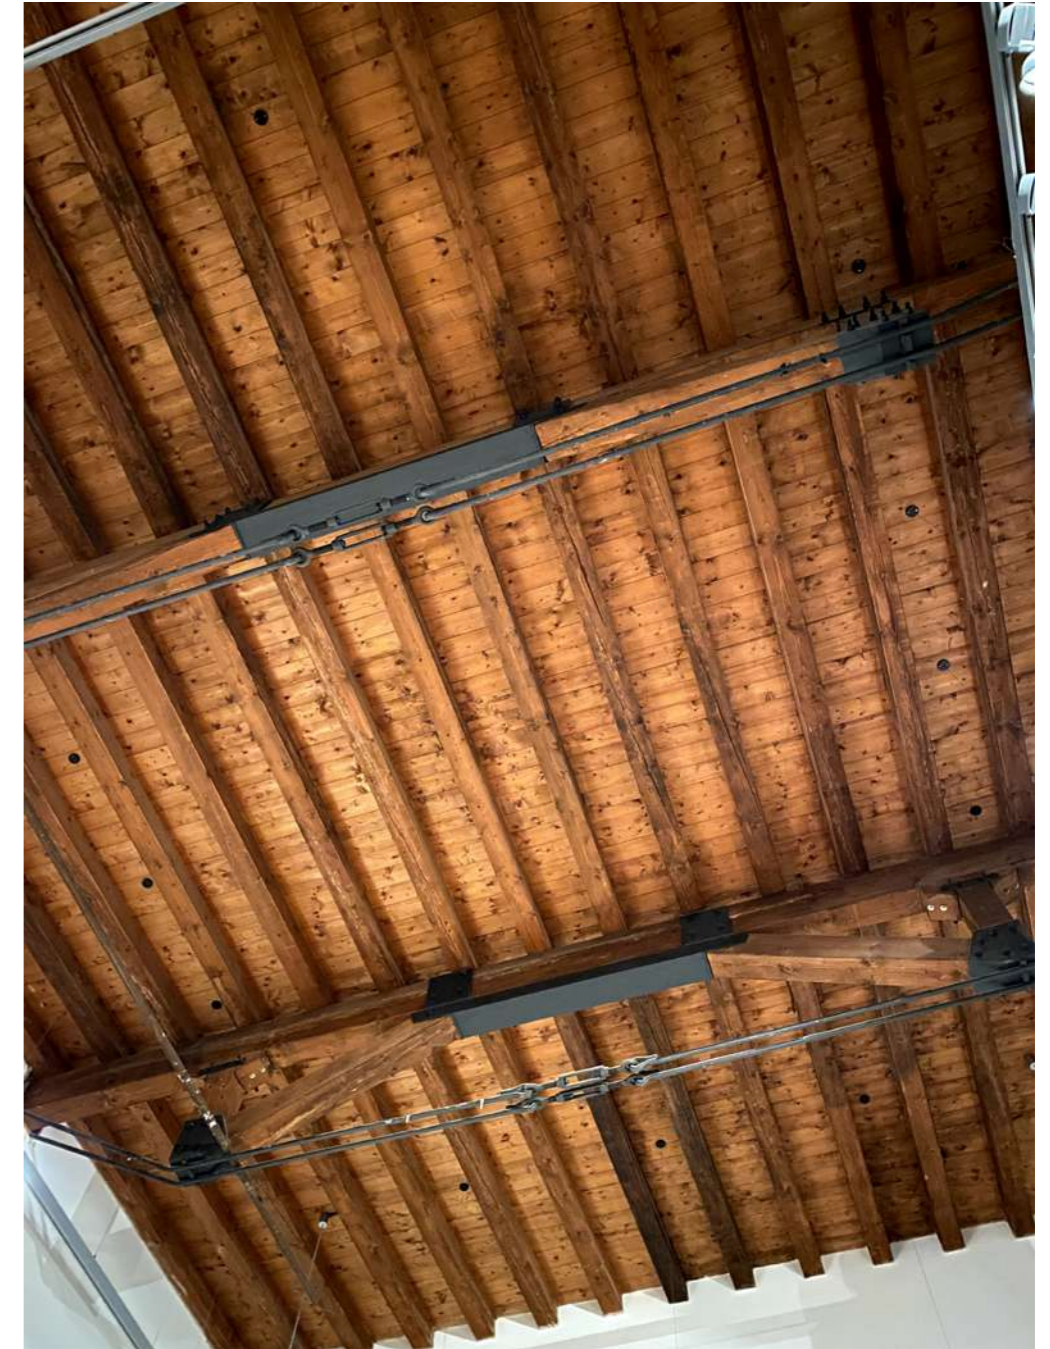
Consolidation works and creation of wooden beams with steel reinforcements. © Luisa Lombardo
